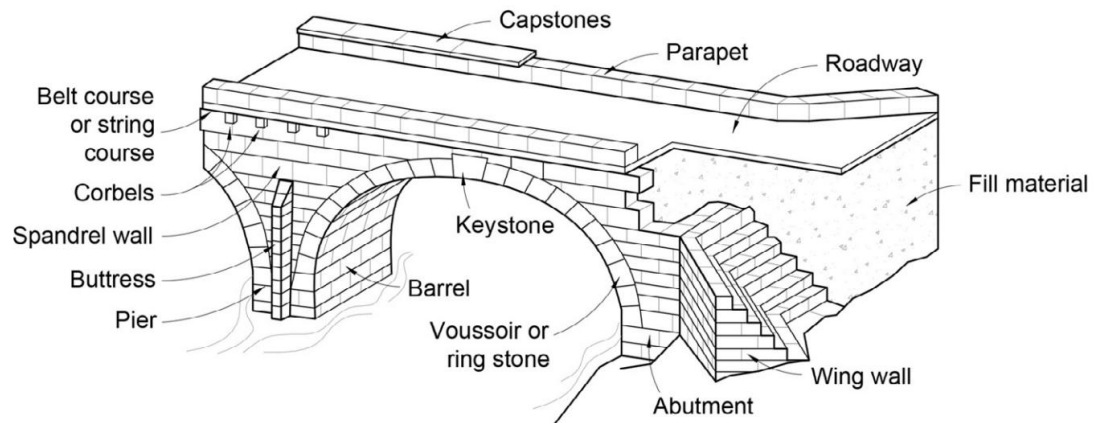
Elements of masonry arch bridges (Pipinato, 2016).
